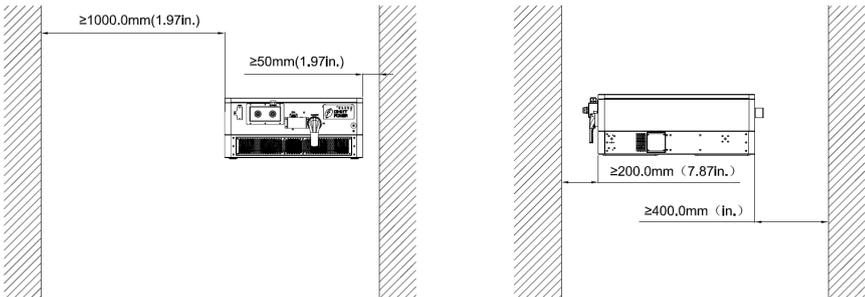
1 Install a single PCS horizontally on mounting bracket
